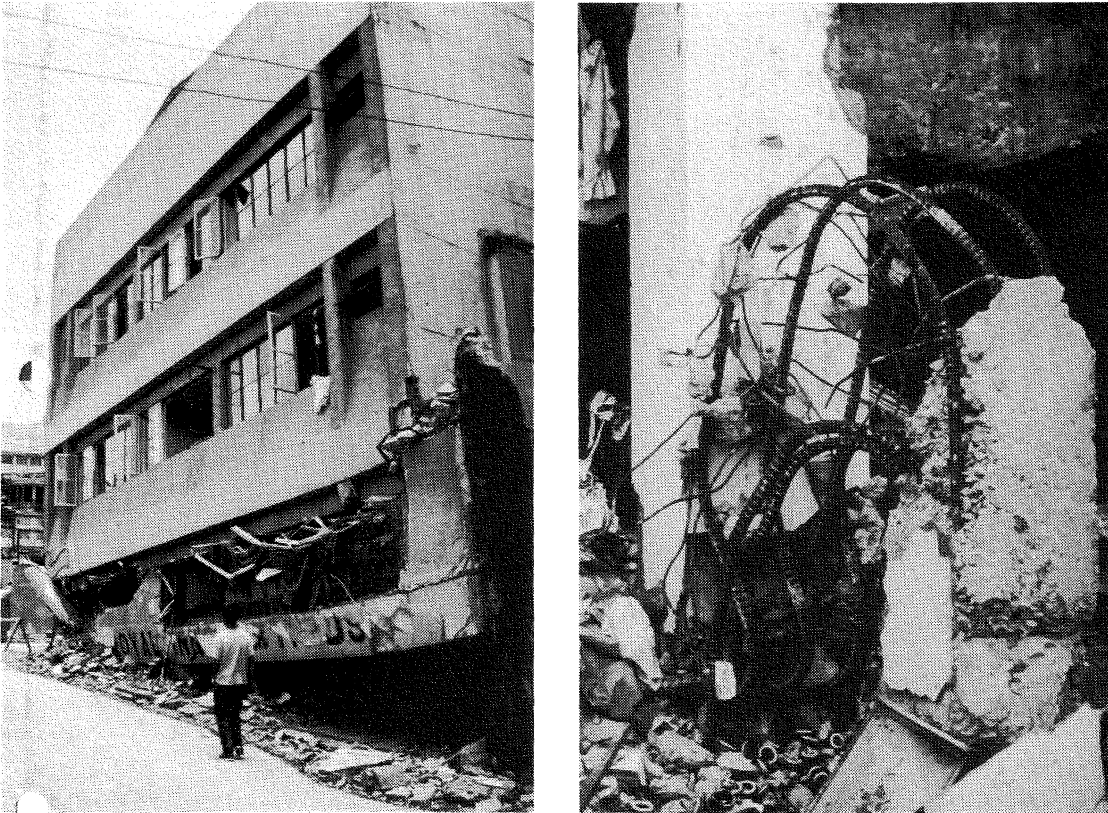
Soft storeys would test better reinforced columns than this one at the Royal Hotel, Baguio
